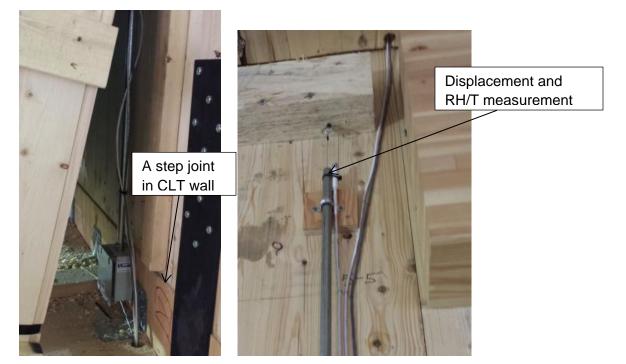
A displacement sensor covering a horizontal step lap joint in CLT (left photo) together with an RH/T sensor (right photo) on Floor 5 at Location 5
